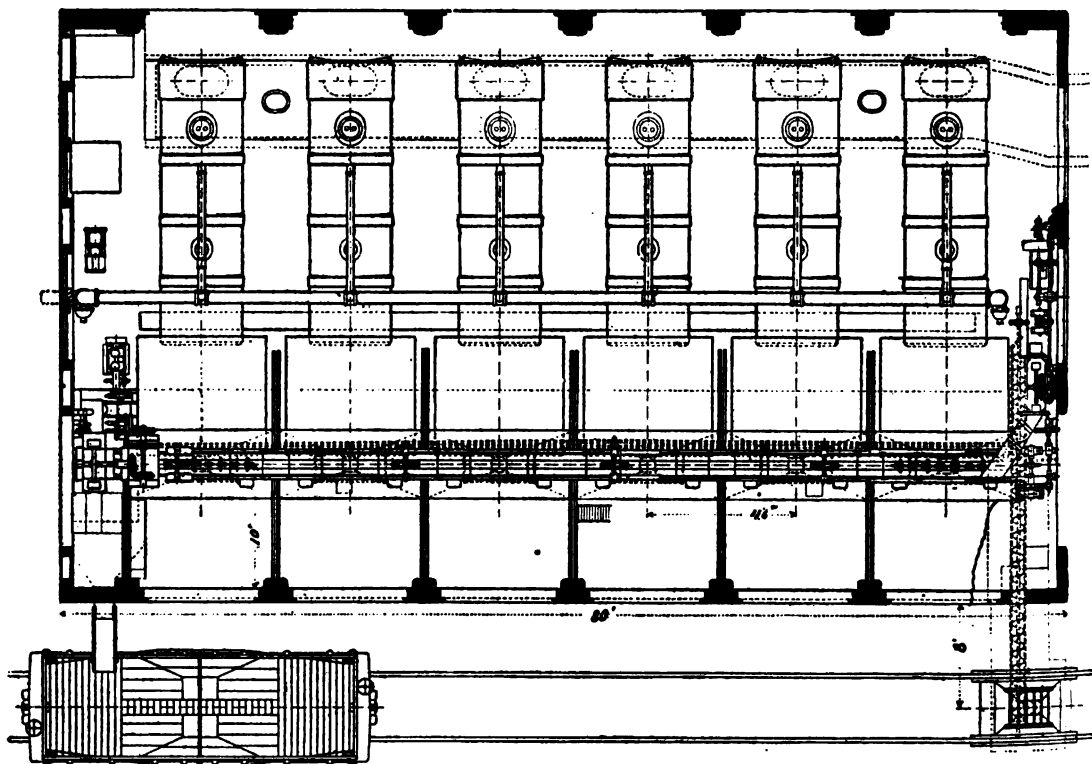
Plan of Coal-handling Plant of the Juniata Works, Altona, Pittsburg.
